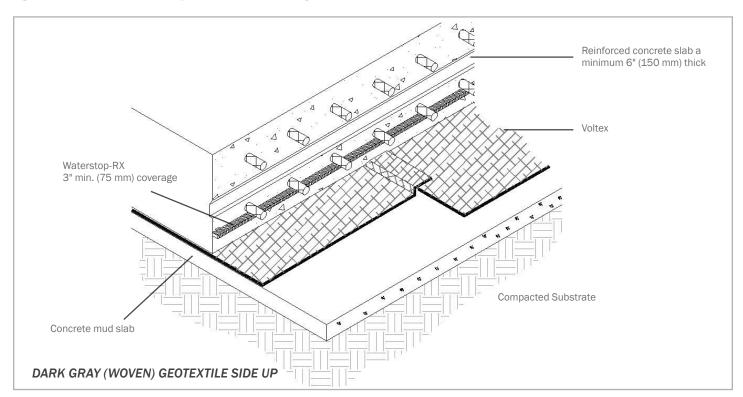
Voltex installed over a mud slab requires a minimum 6" (150 mm) thick reinforced slab.
